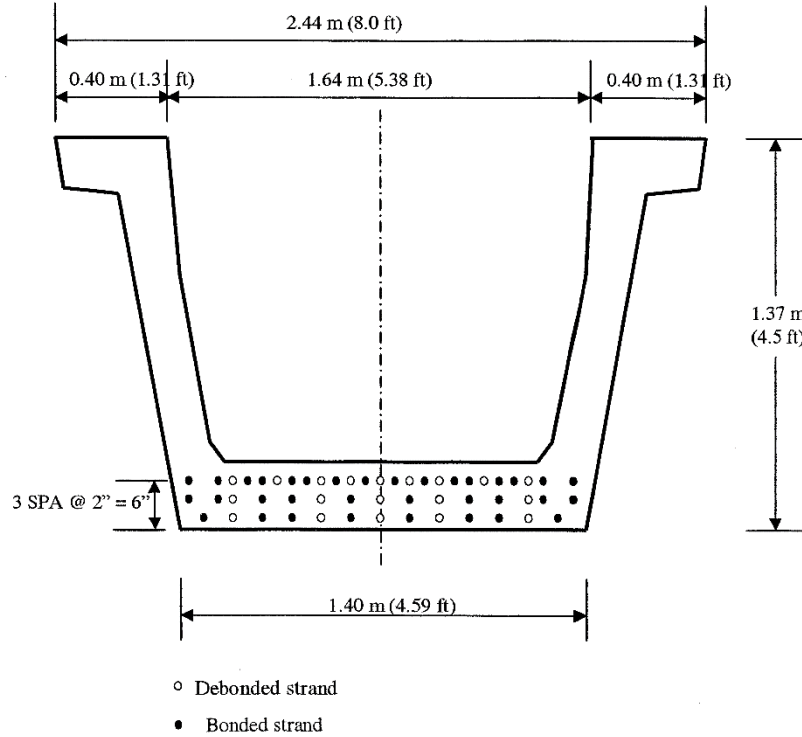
Bridge 9266 – typical U54B cross-section (Liang 2004).
